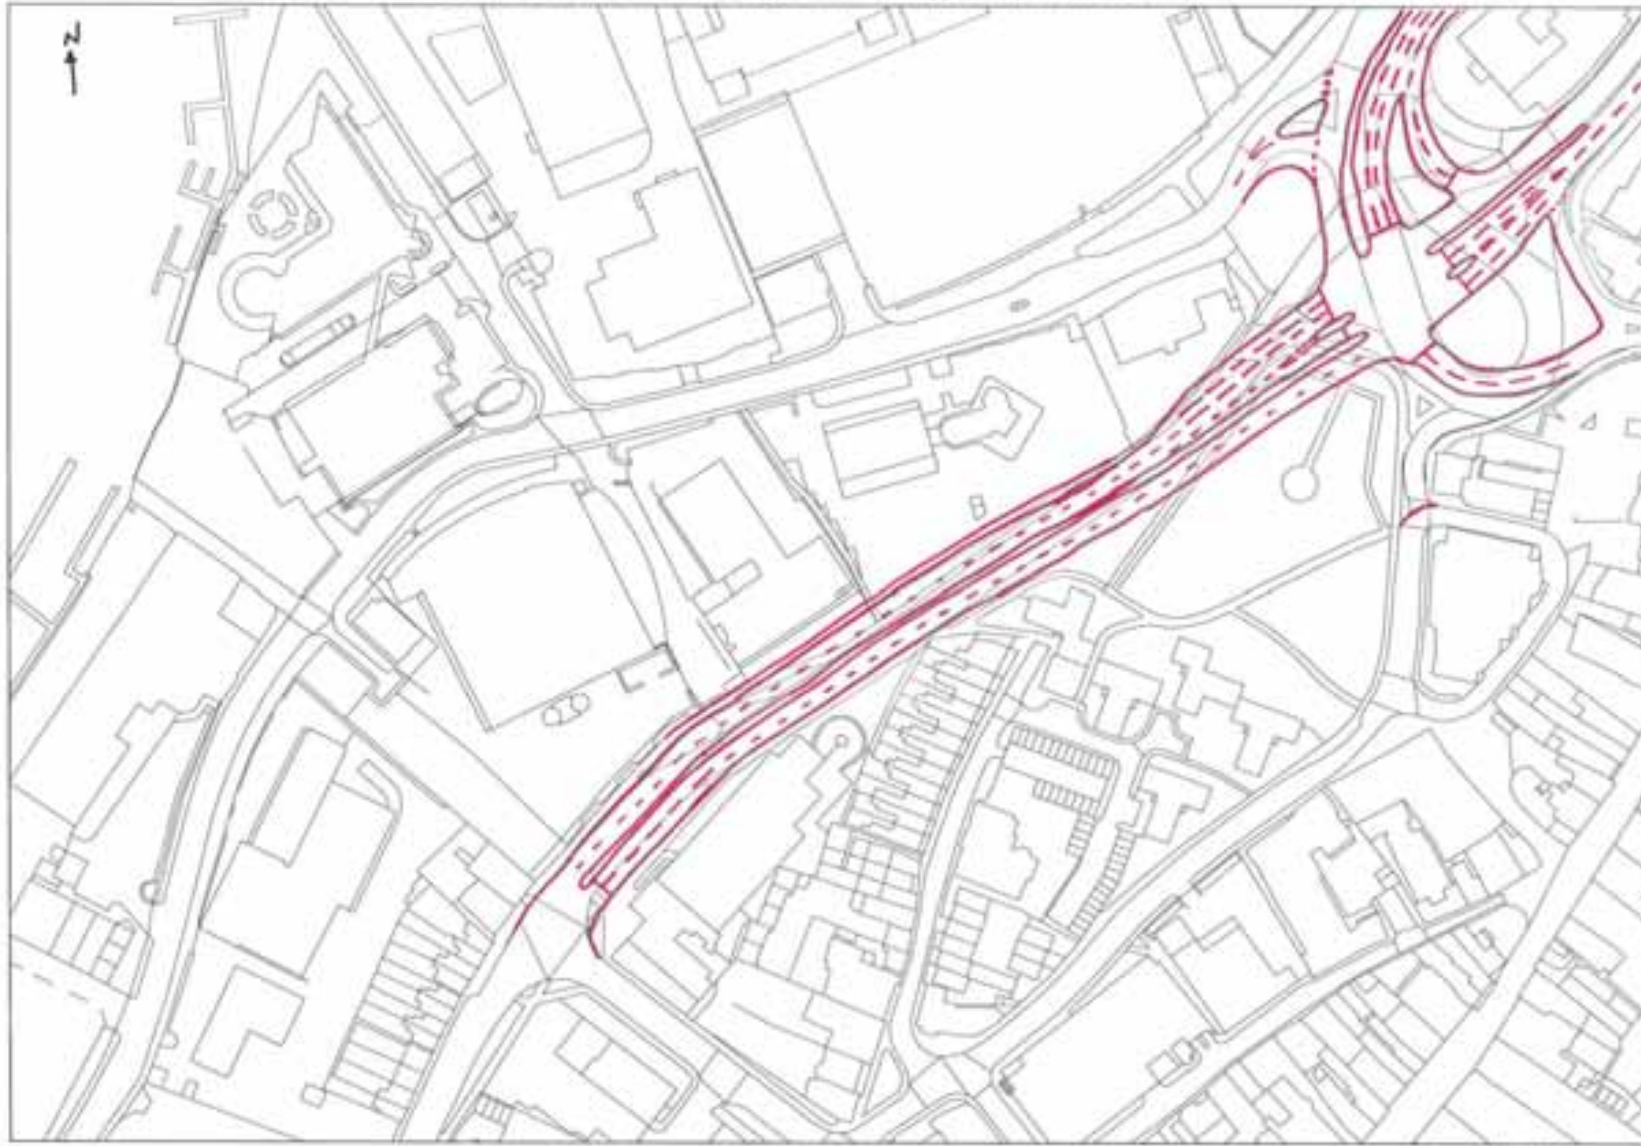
Poole Twin Sails Bridge – Alternative Approach (Northern Section)
